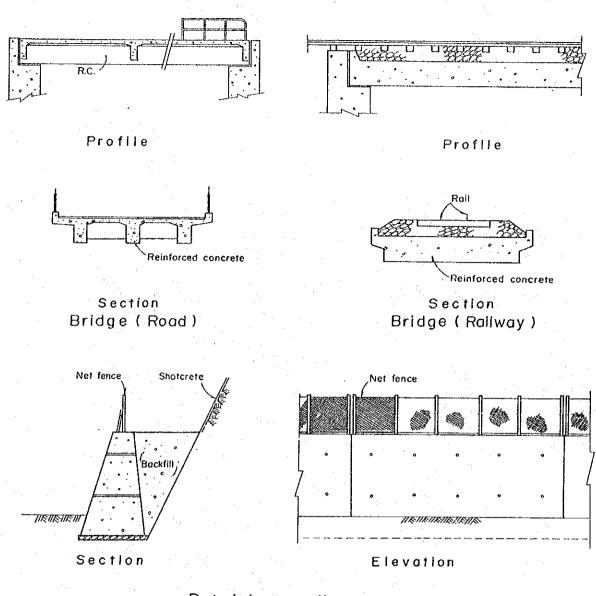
Proposed Structural Plans for Quebrada Areas
